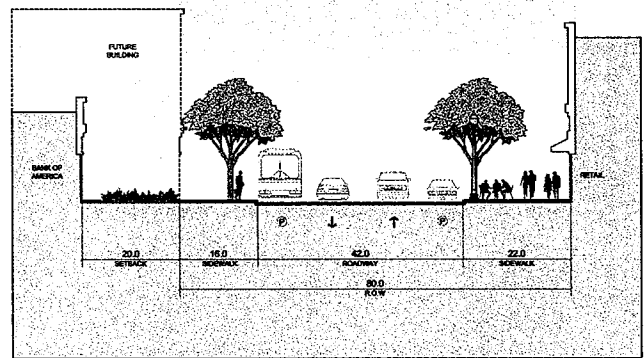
Existing Center Street configuration (view towards Oxford Street)
